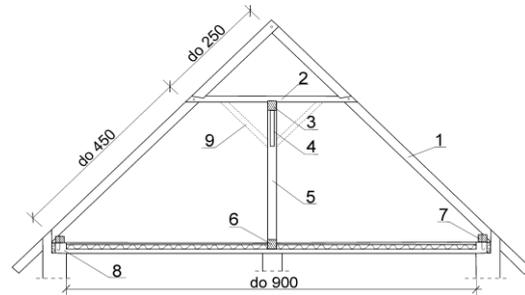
Collar-beam roof with supported in one point collar rafters: 1 - rafter, 2 - collar rafter, 3 - purlin, 4 - angle brace (angle tie), 5 - post, 6 - ground sill (sleeper, sole-plate), 7 - plate, 8 - reinforced concrete curb-plate, 9 - extra angle brace
